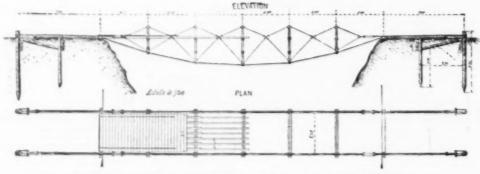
ELEVATION AND PLAN OF THE GISCLARD BRIDGE
